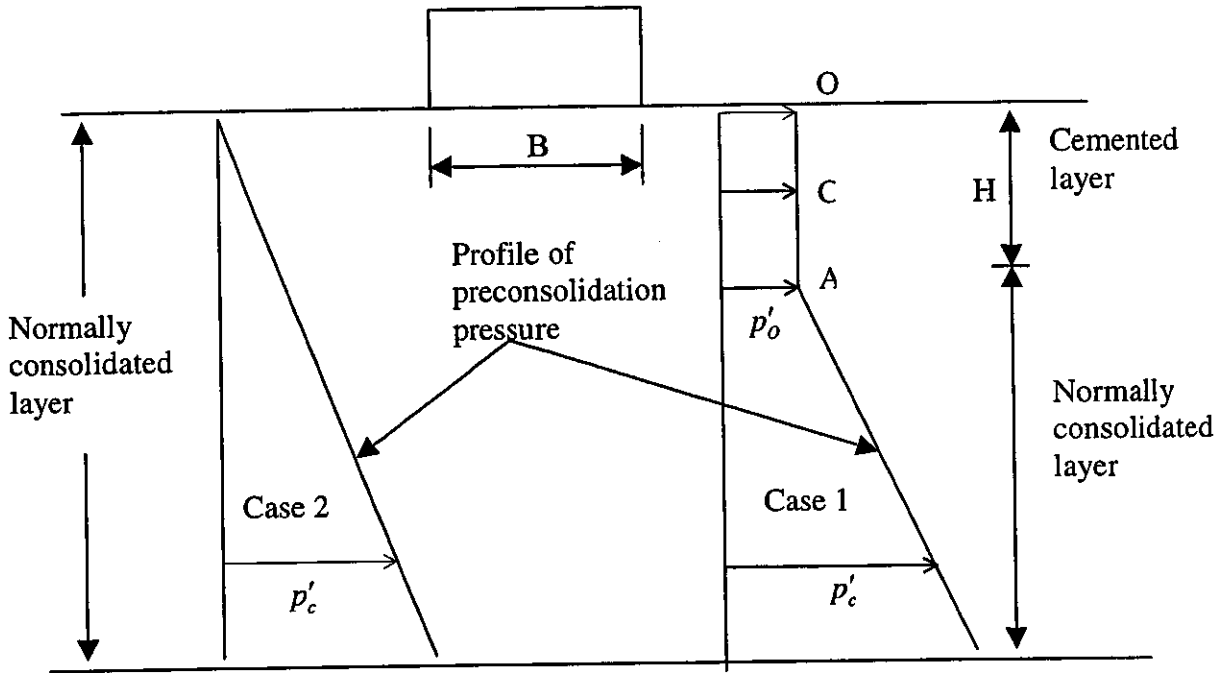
Assumed profiles of preconsolidation pressure below surface circular footing
